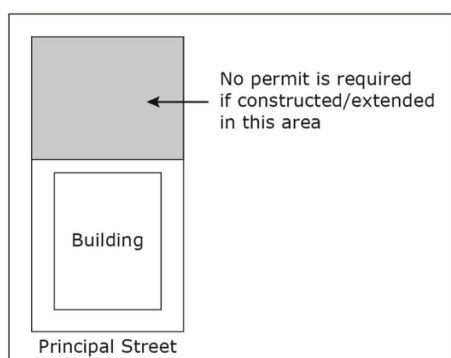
Construction/extension of outbuilding to a not contributory property (not located on a corner site).
